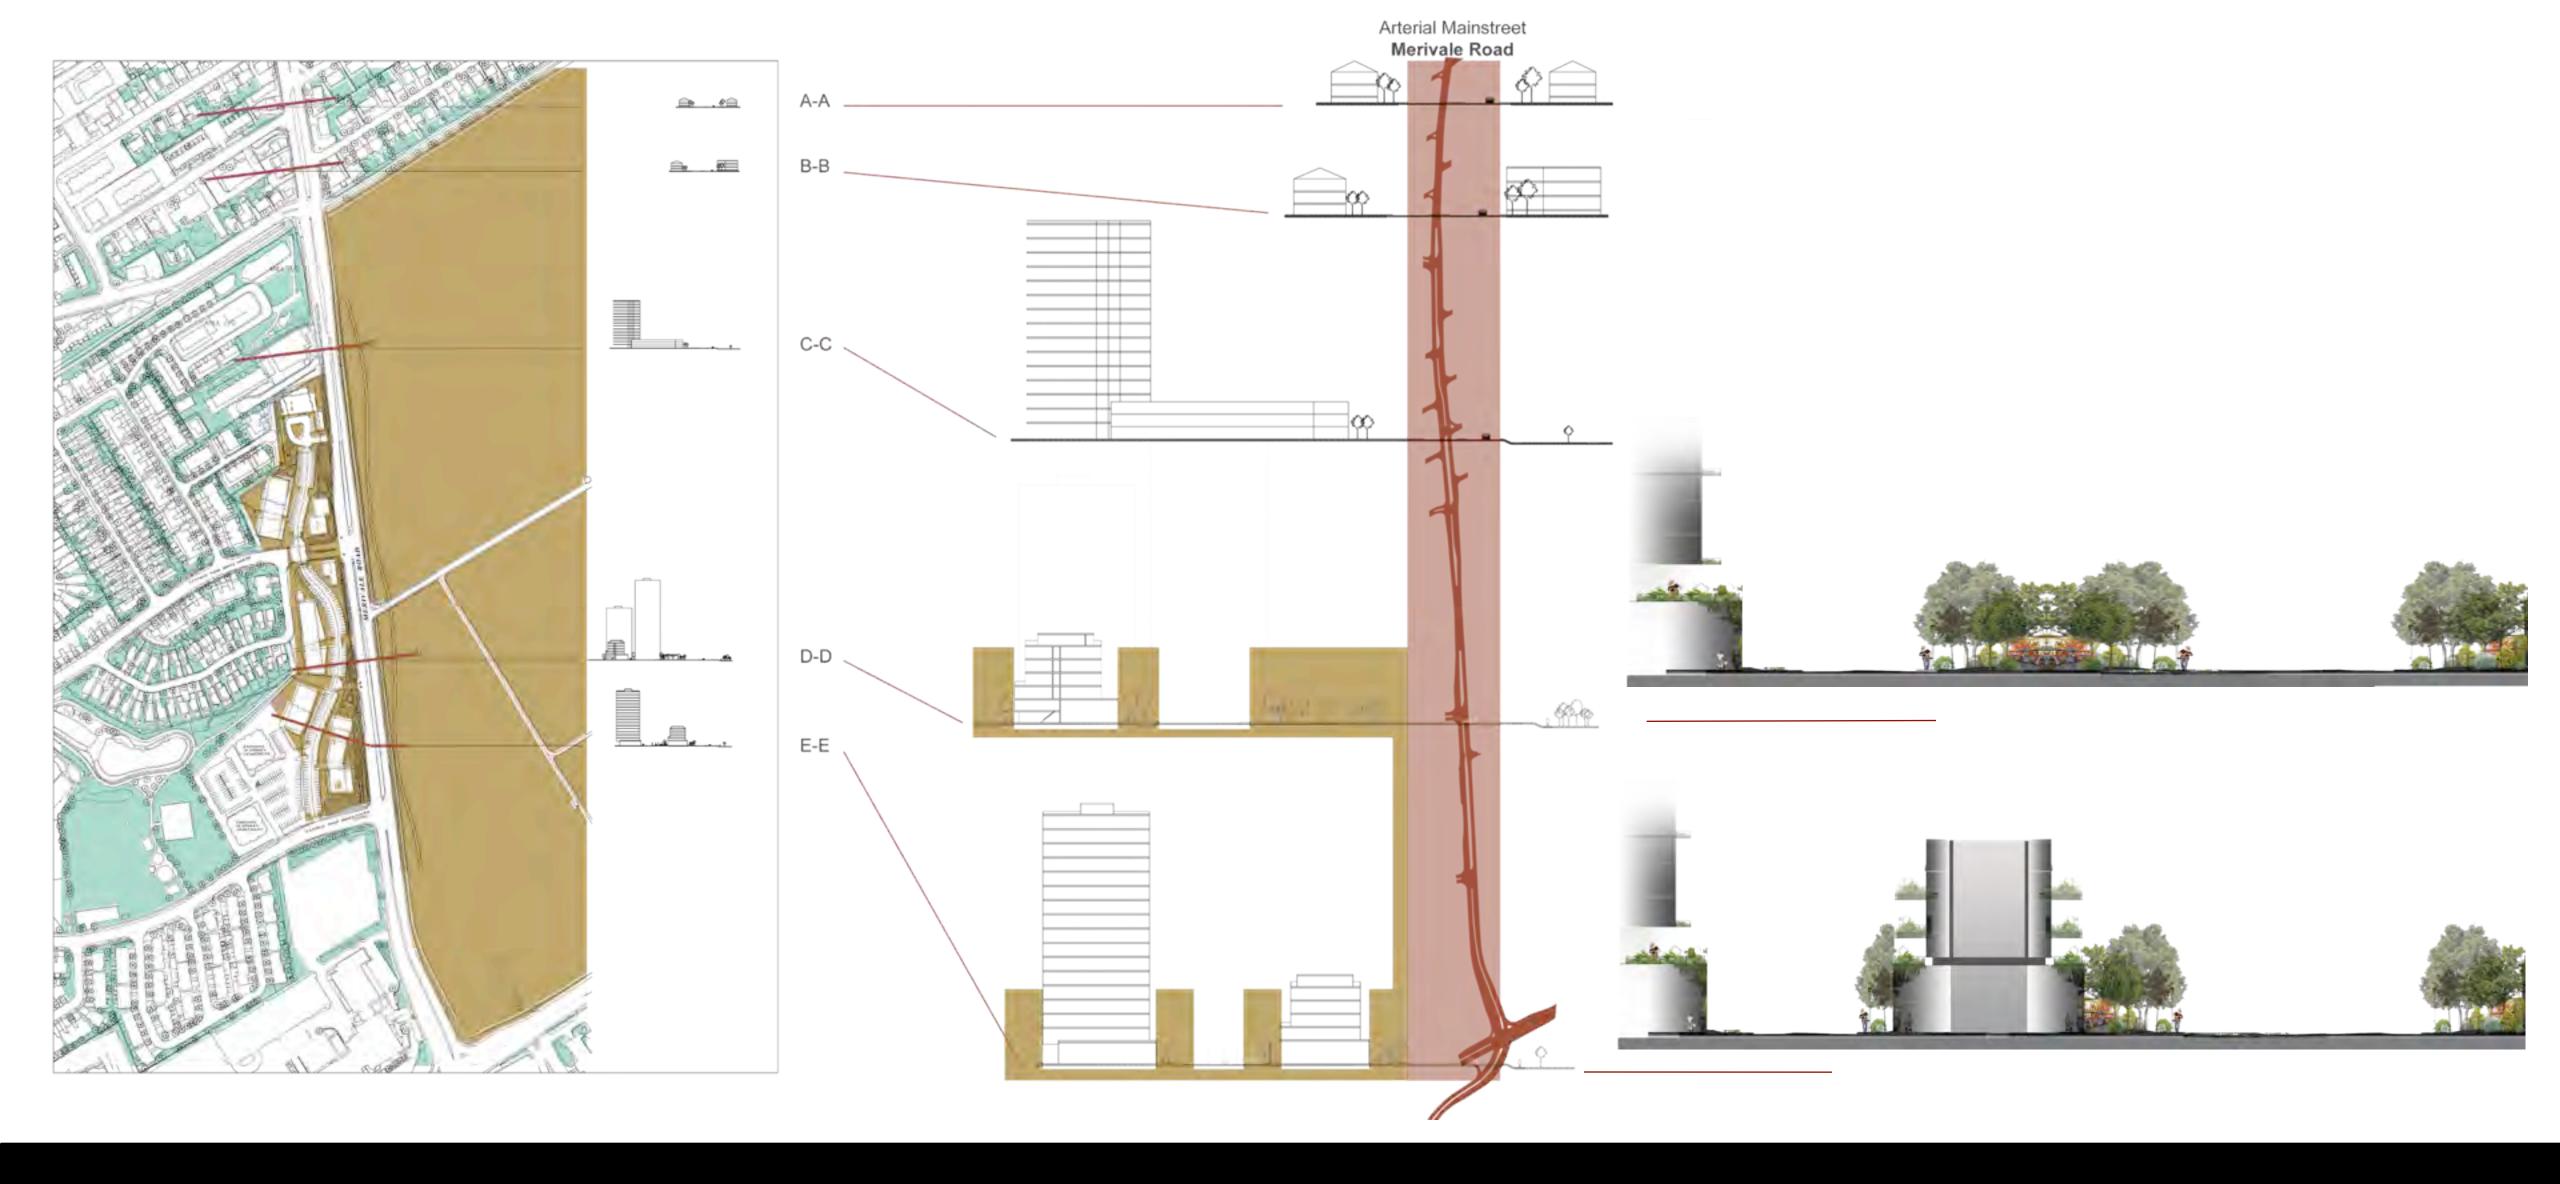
A typical Arterial Mainstreet section with buildings close to the street.
